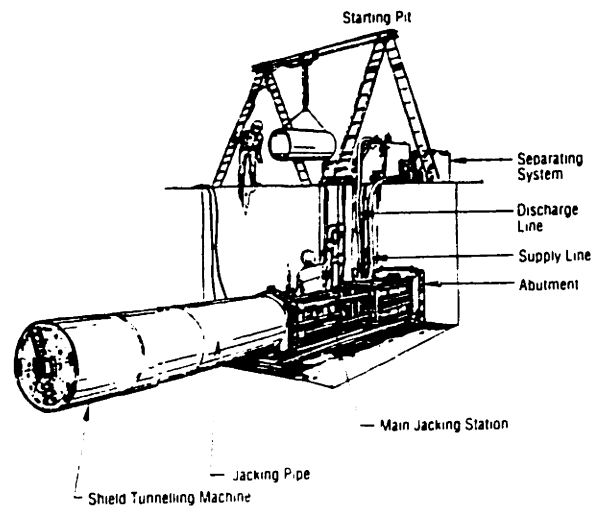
Pipe jacking methods (Stein et al., 1989)
